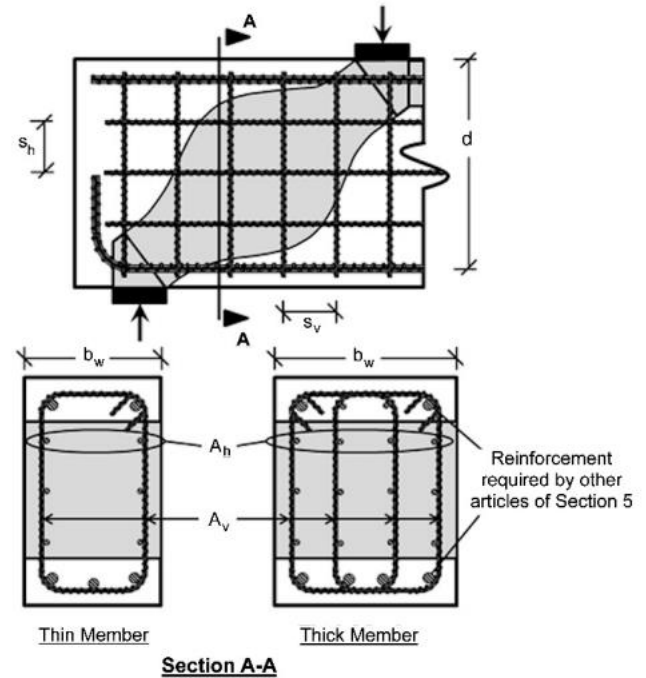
Distribution of Crack Control Reinforcement in Struts
